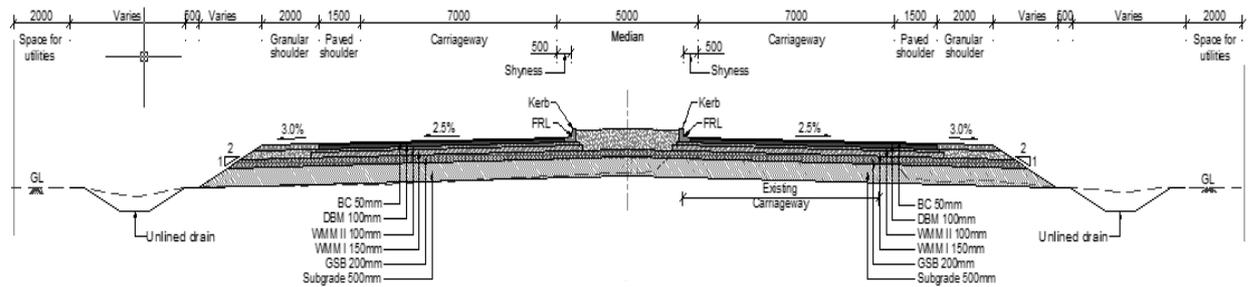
TCS 1A.3- 4 Lane Rural Area (Left Side Existing Road)
